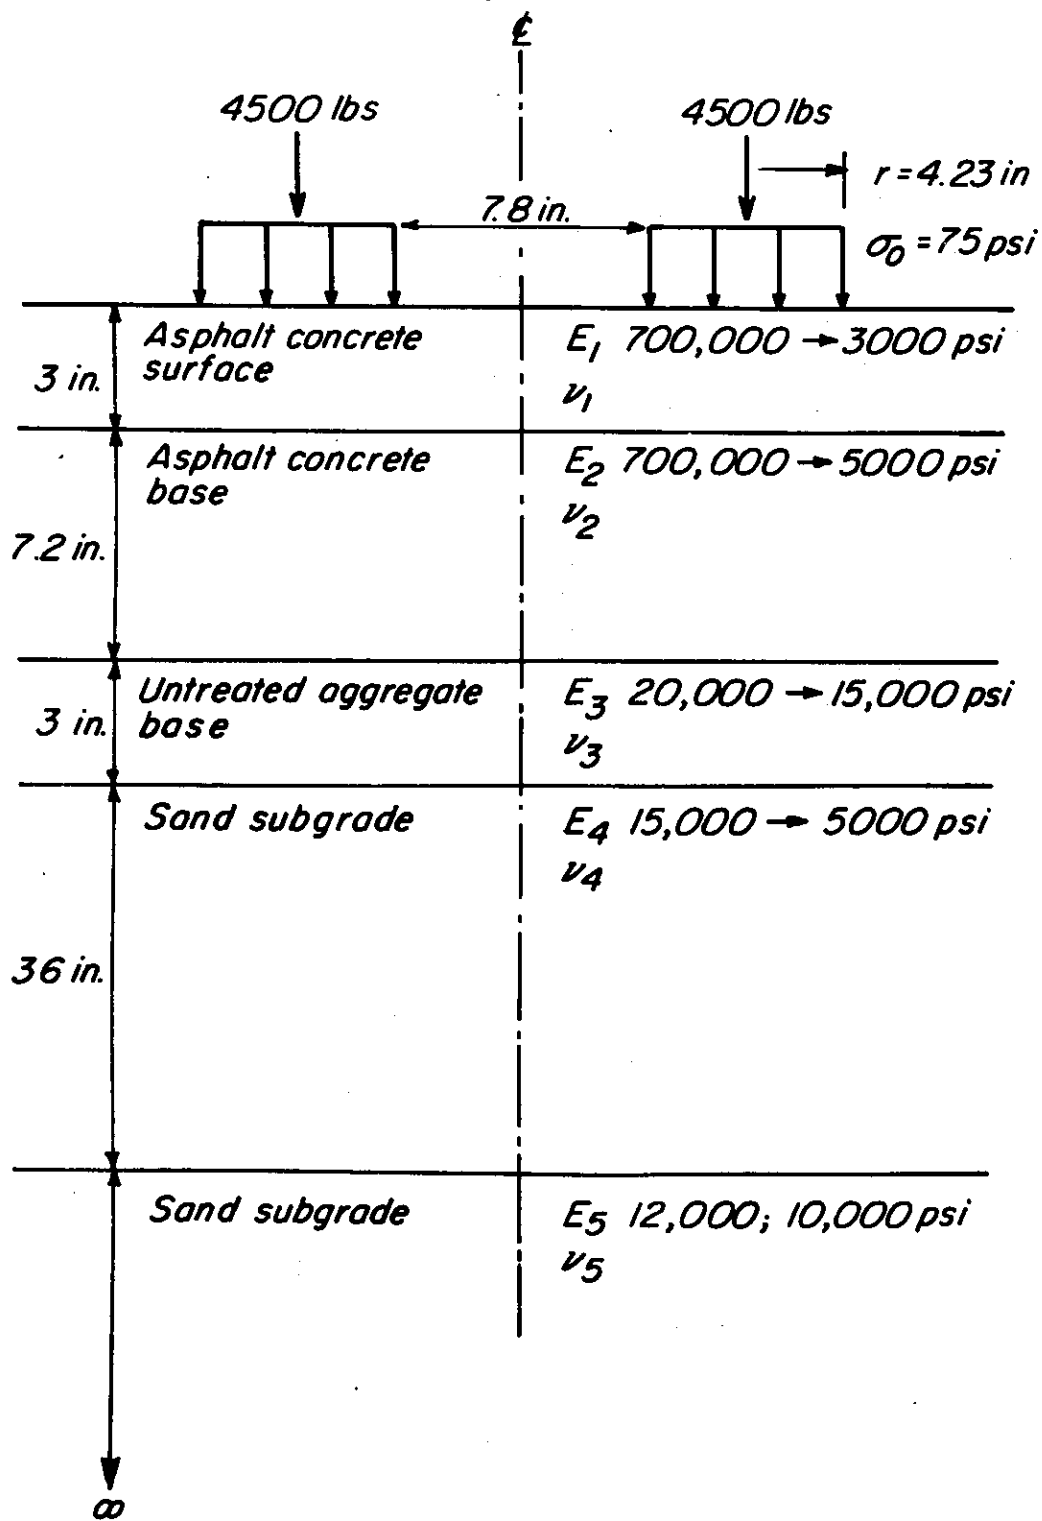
Representation of Indio pavement section for pavement analyses.
